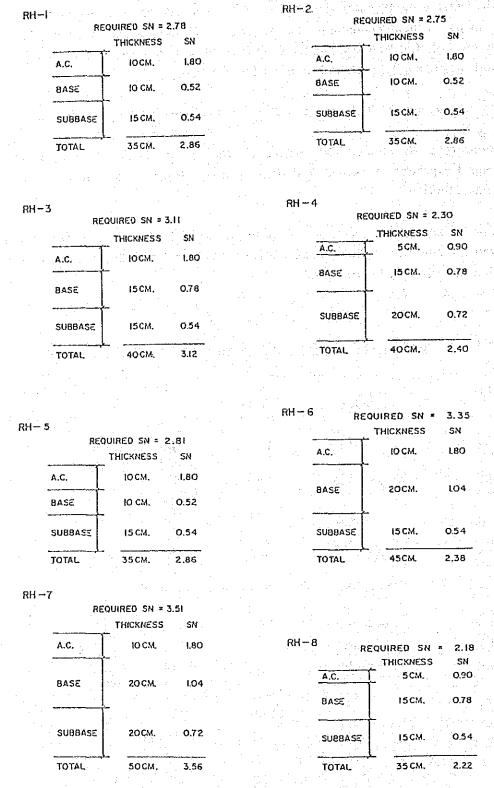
RECOMMENDED PAVEMENT STRUCTURAL COMPONENTS FOR RECONSTRUCTION
